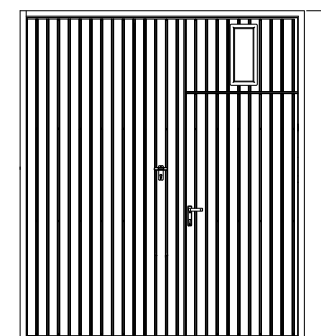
A/H horizontal glazing in a double-leaf door with a wicket door.
